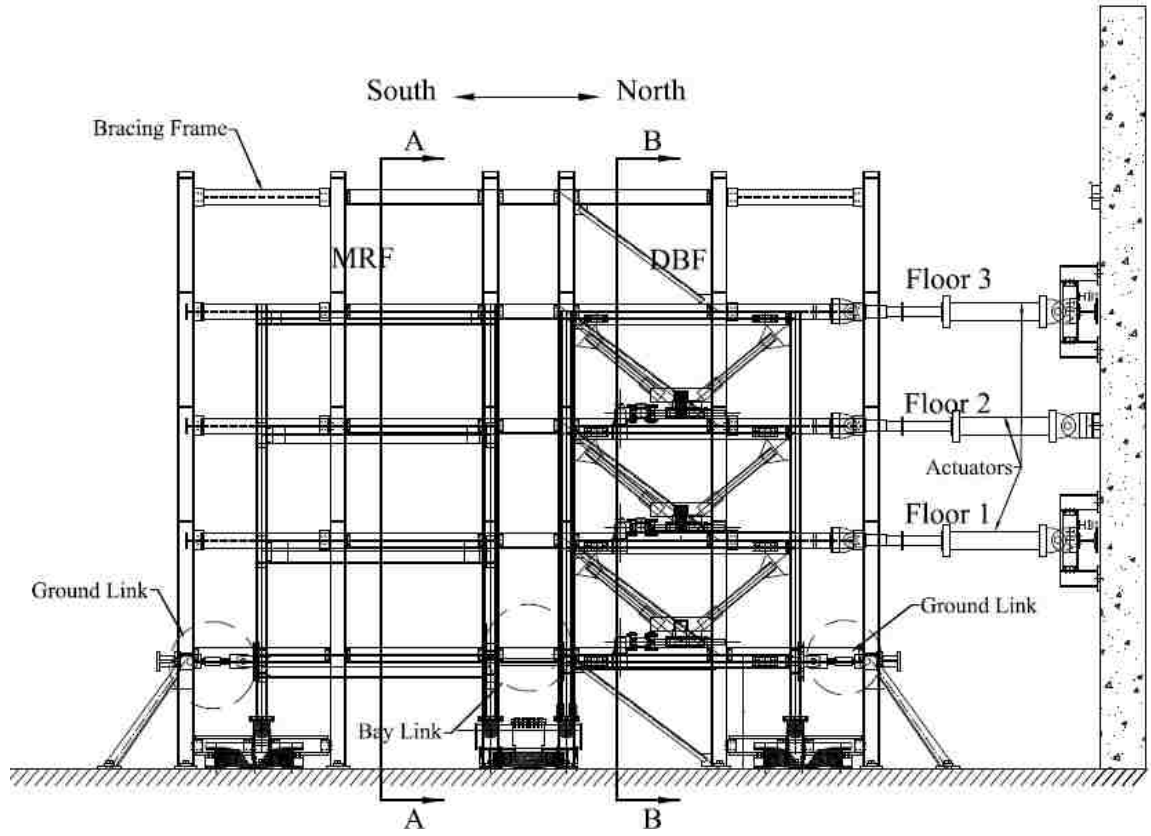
Elevation of bracing frame with DBF and MRF installed
